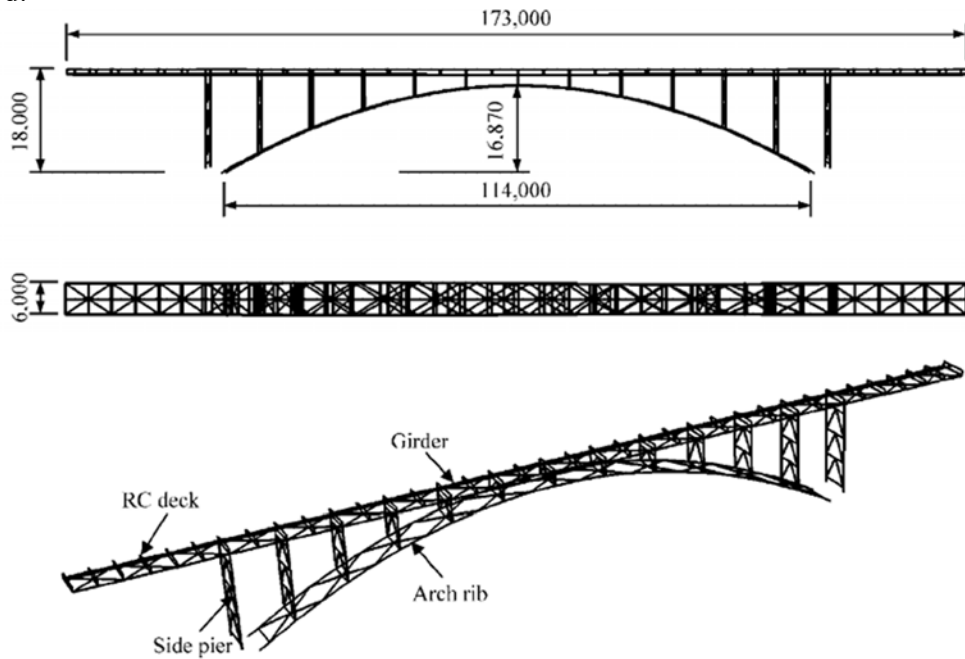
Layout of the Steel Arch Bridge to be retrofitted: (a) Elevation; (b) Plan; and (c) 3-D View (Usami et al., 2005) (Unit:mm) (Usami et al., 2005)
